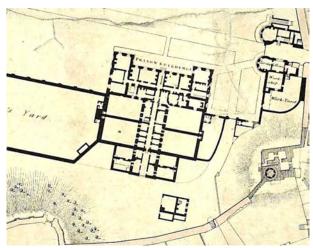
Segment of a plan of the south curtain wall by Willson, dated 1832
